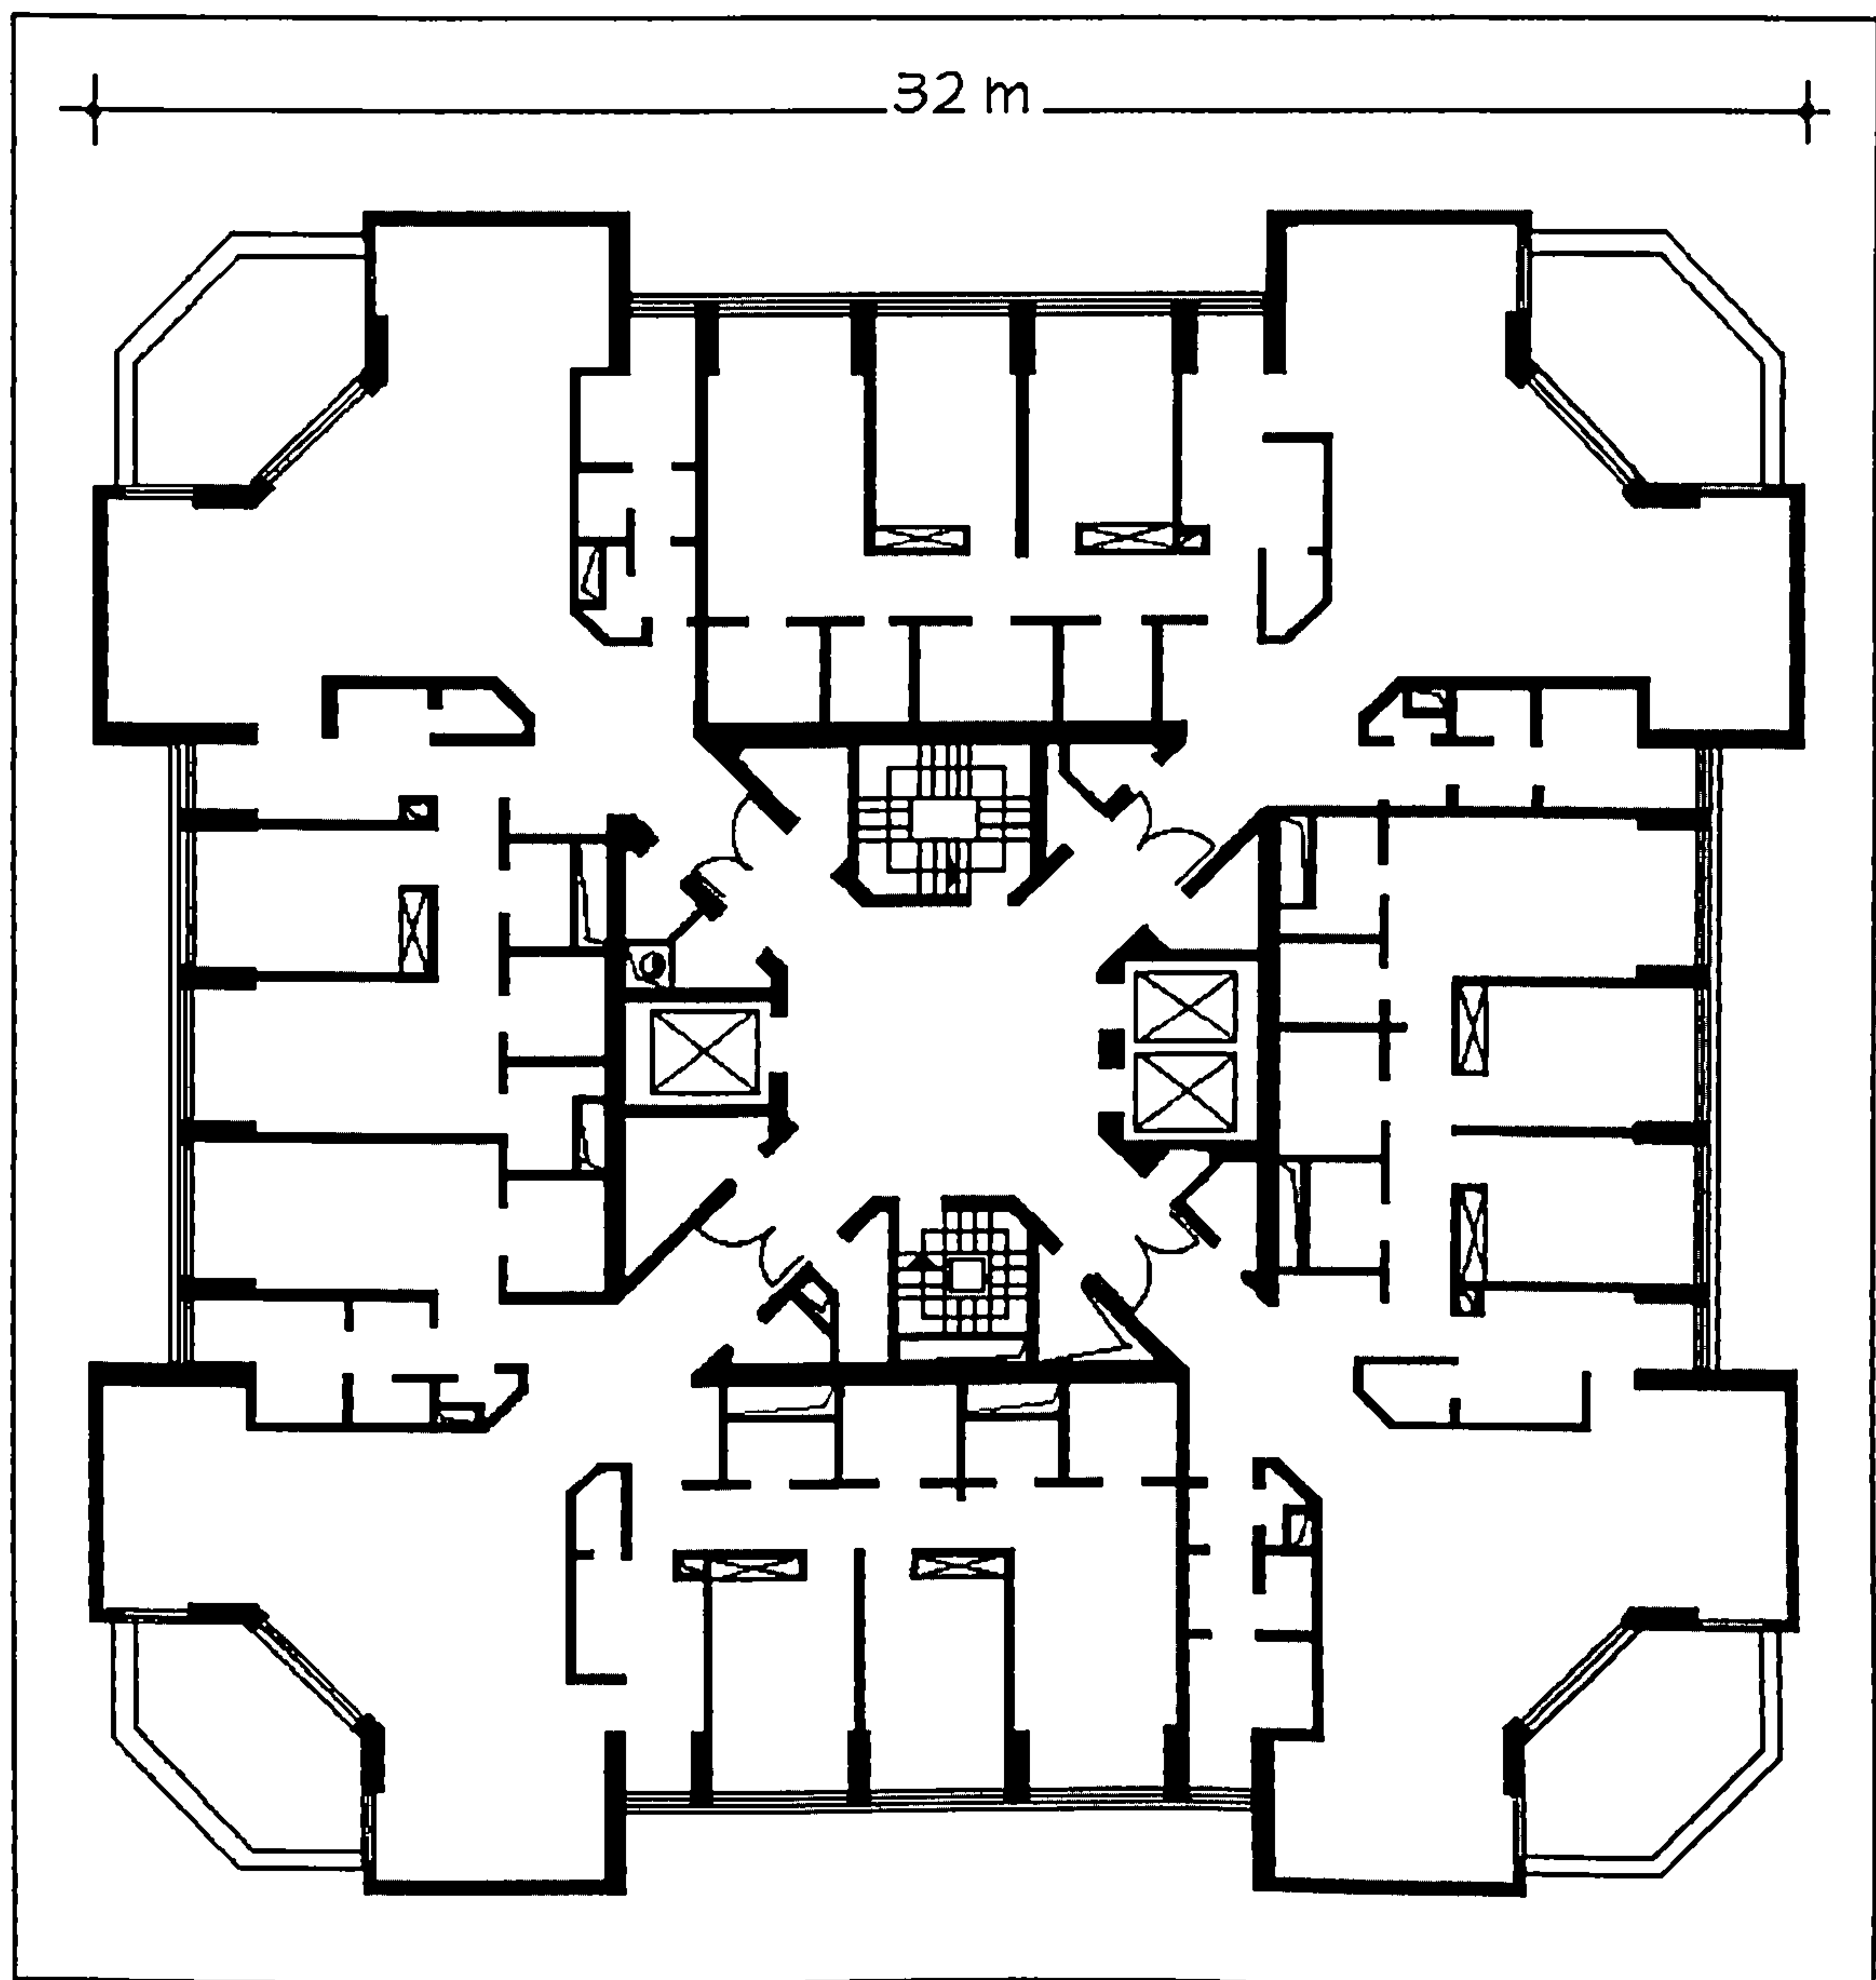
Typical plan of a residential floor of Eskan tower buildings.
